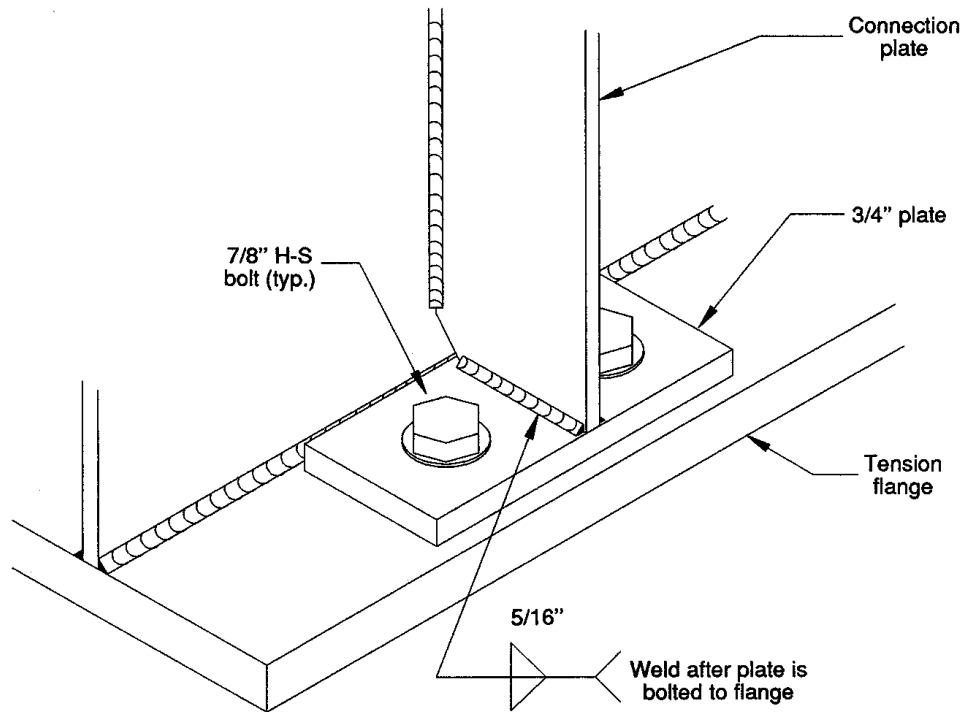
Bolted Base Plate Retrofit Example [3]
